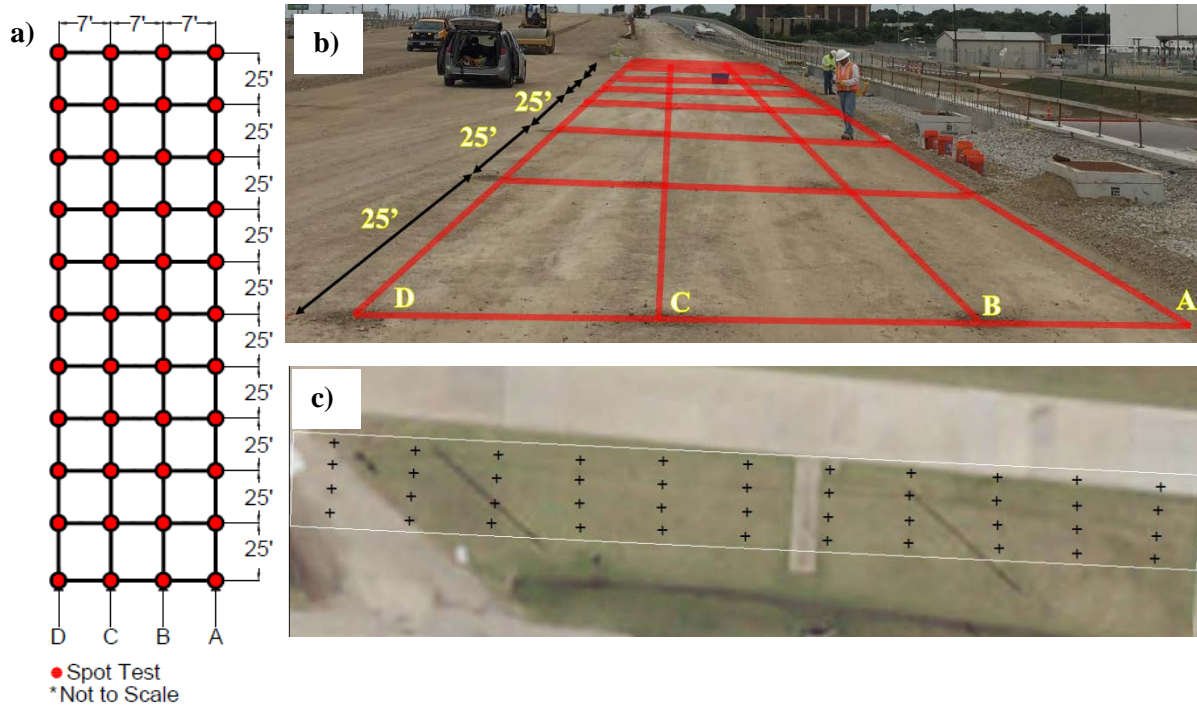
(a) Schematic of the Test Section, (b) Site View with Grid Overimposed over Test Section and (c) Satellite View Showing Spot Test Points.
